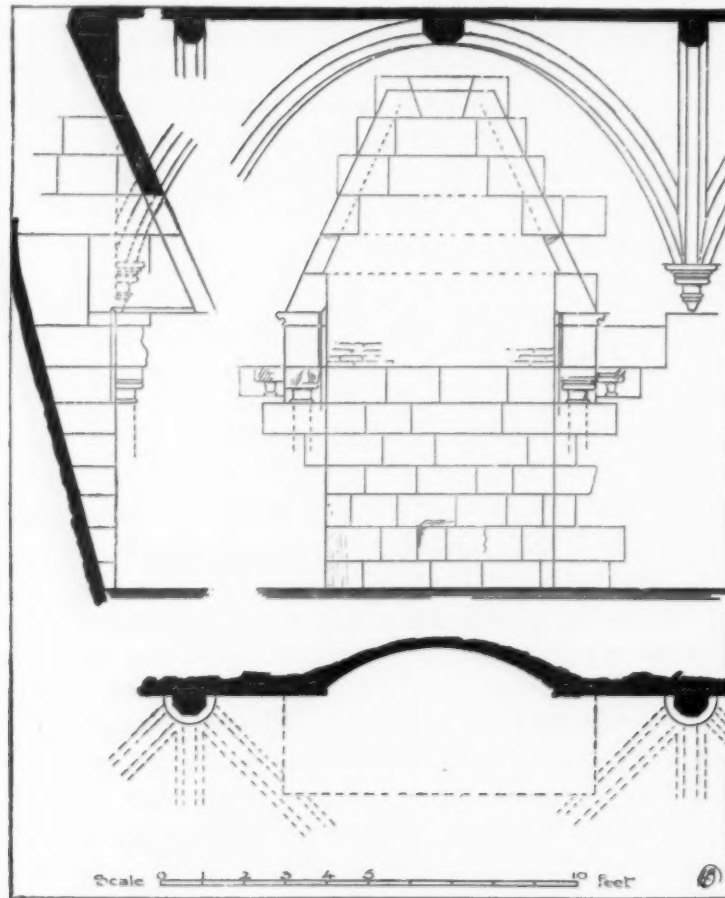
Plan, section, and elevation of the warming house fireplace.
